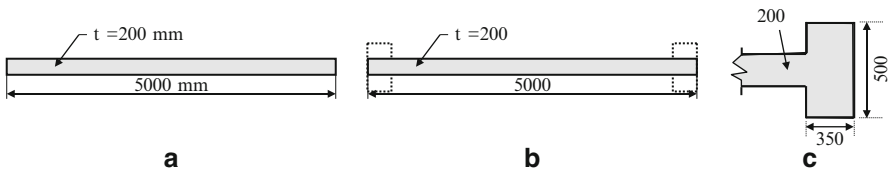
Shear wall with boundary elements. (a) Plain shear wall. (b) Boundary elements added. (c) Boundary element
